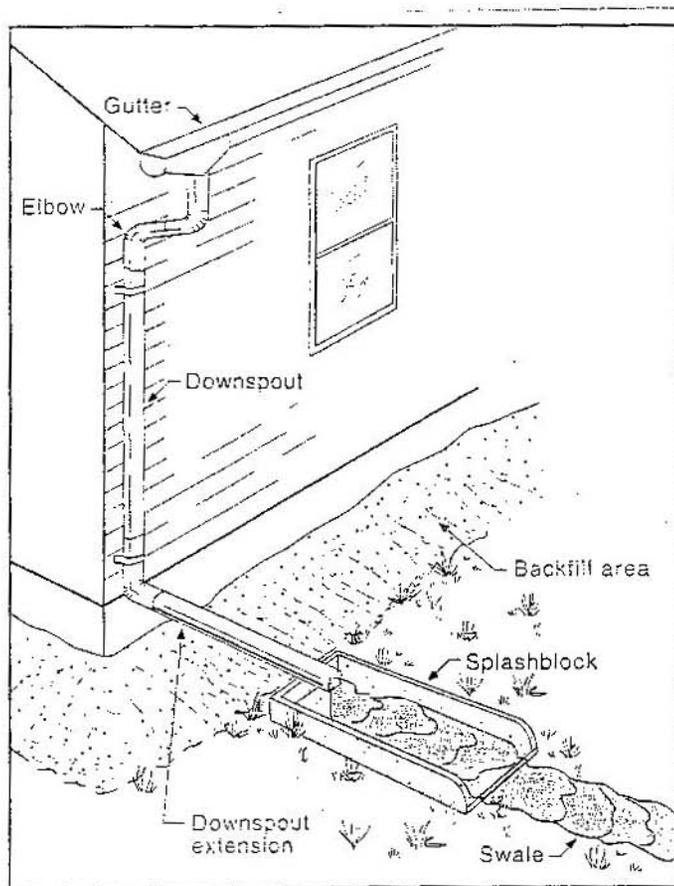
Components of a roof drainage system. (Modified from Jochim, 1987.)
